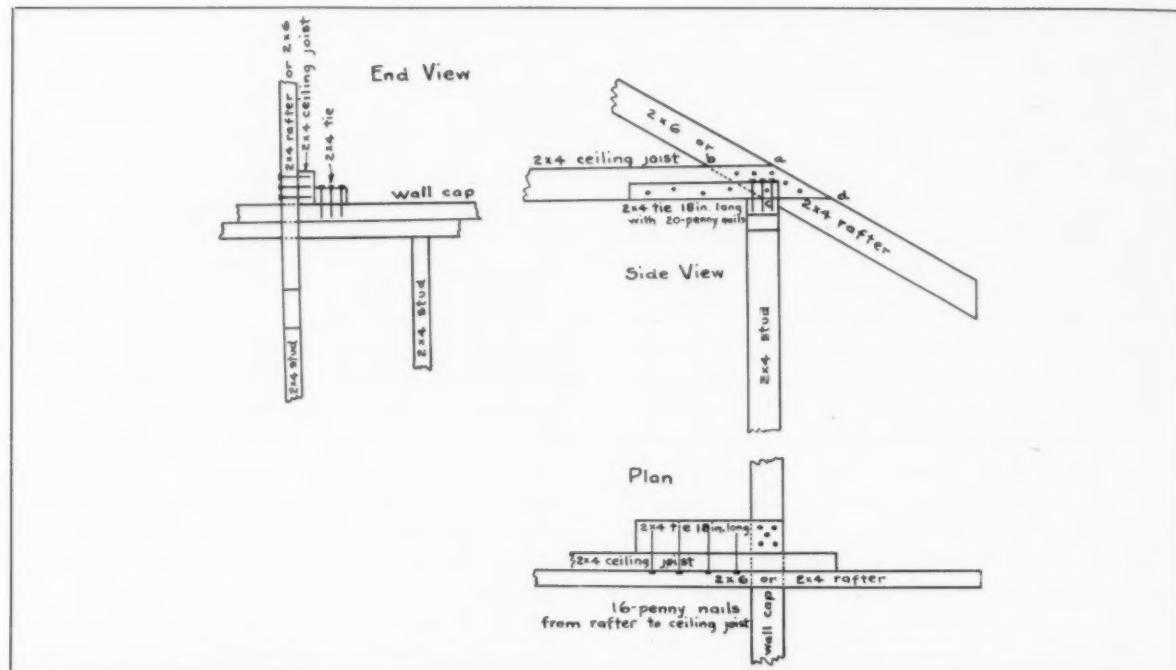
A Method of Anchoring the Roof to the Exterior Walls
